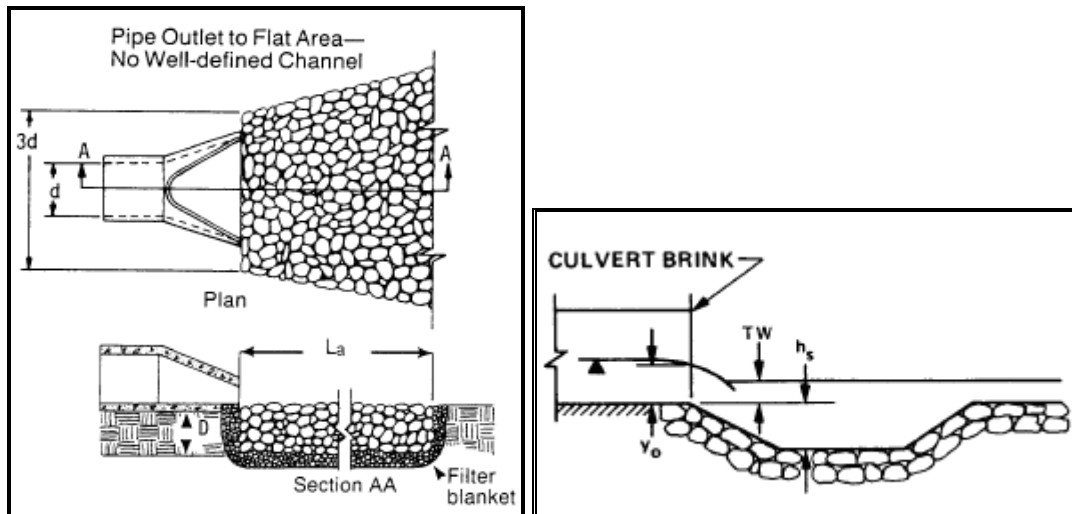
Typical design of a rip rap apron at a stormwater outfall.
